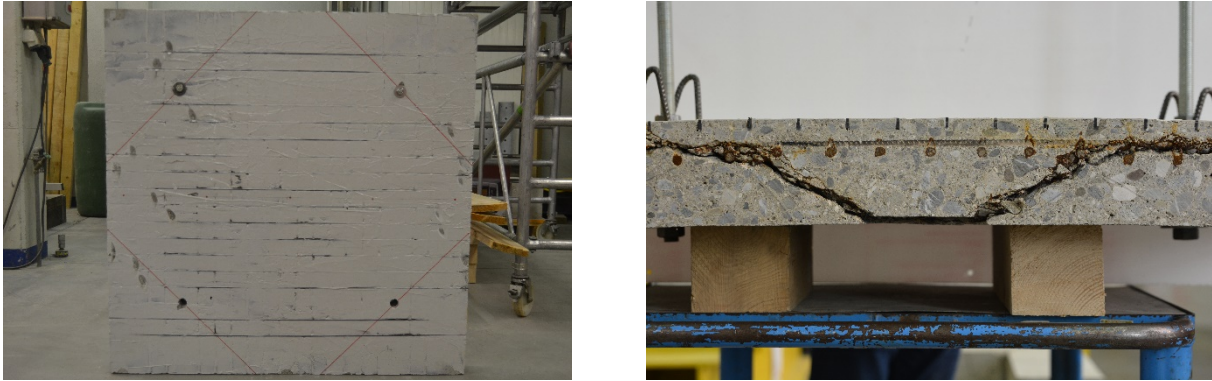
Cracking pattern and internal shear crack of shear-reinforced slab BA01 after failure
